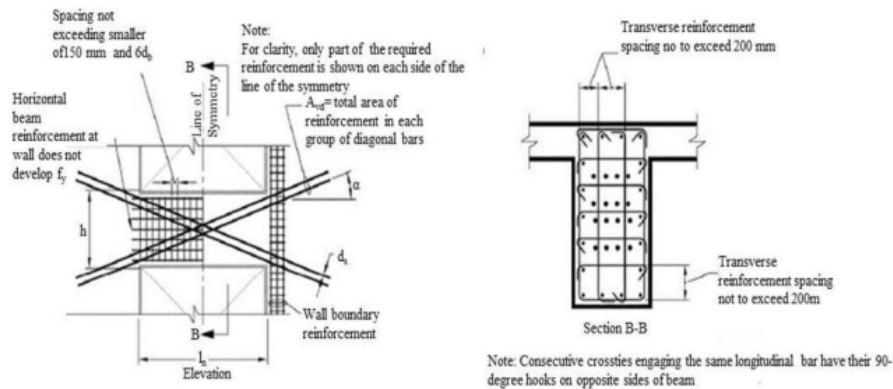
Alternative confinement detailing of diagonally reinforced concrete beam section in coupling beams [16].
